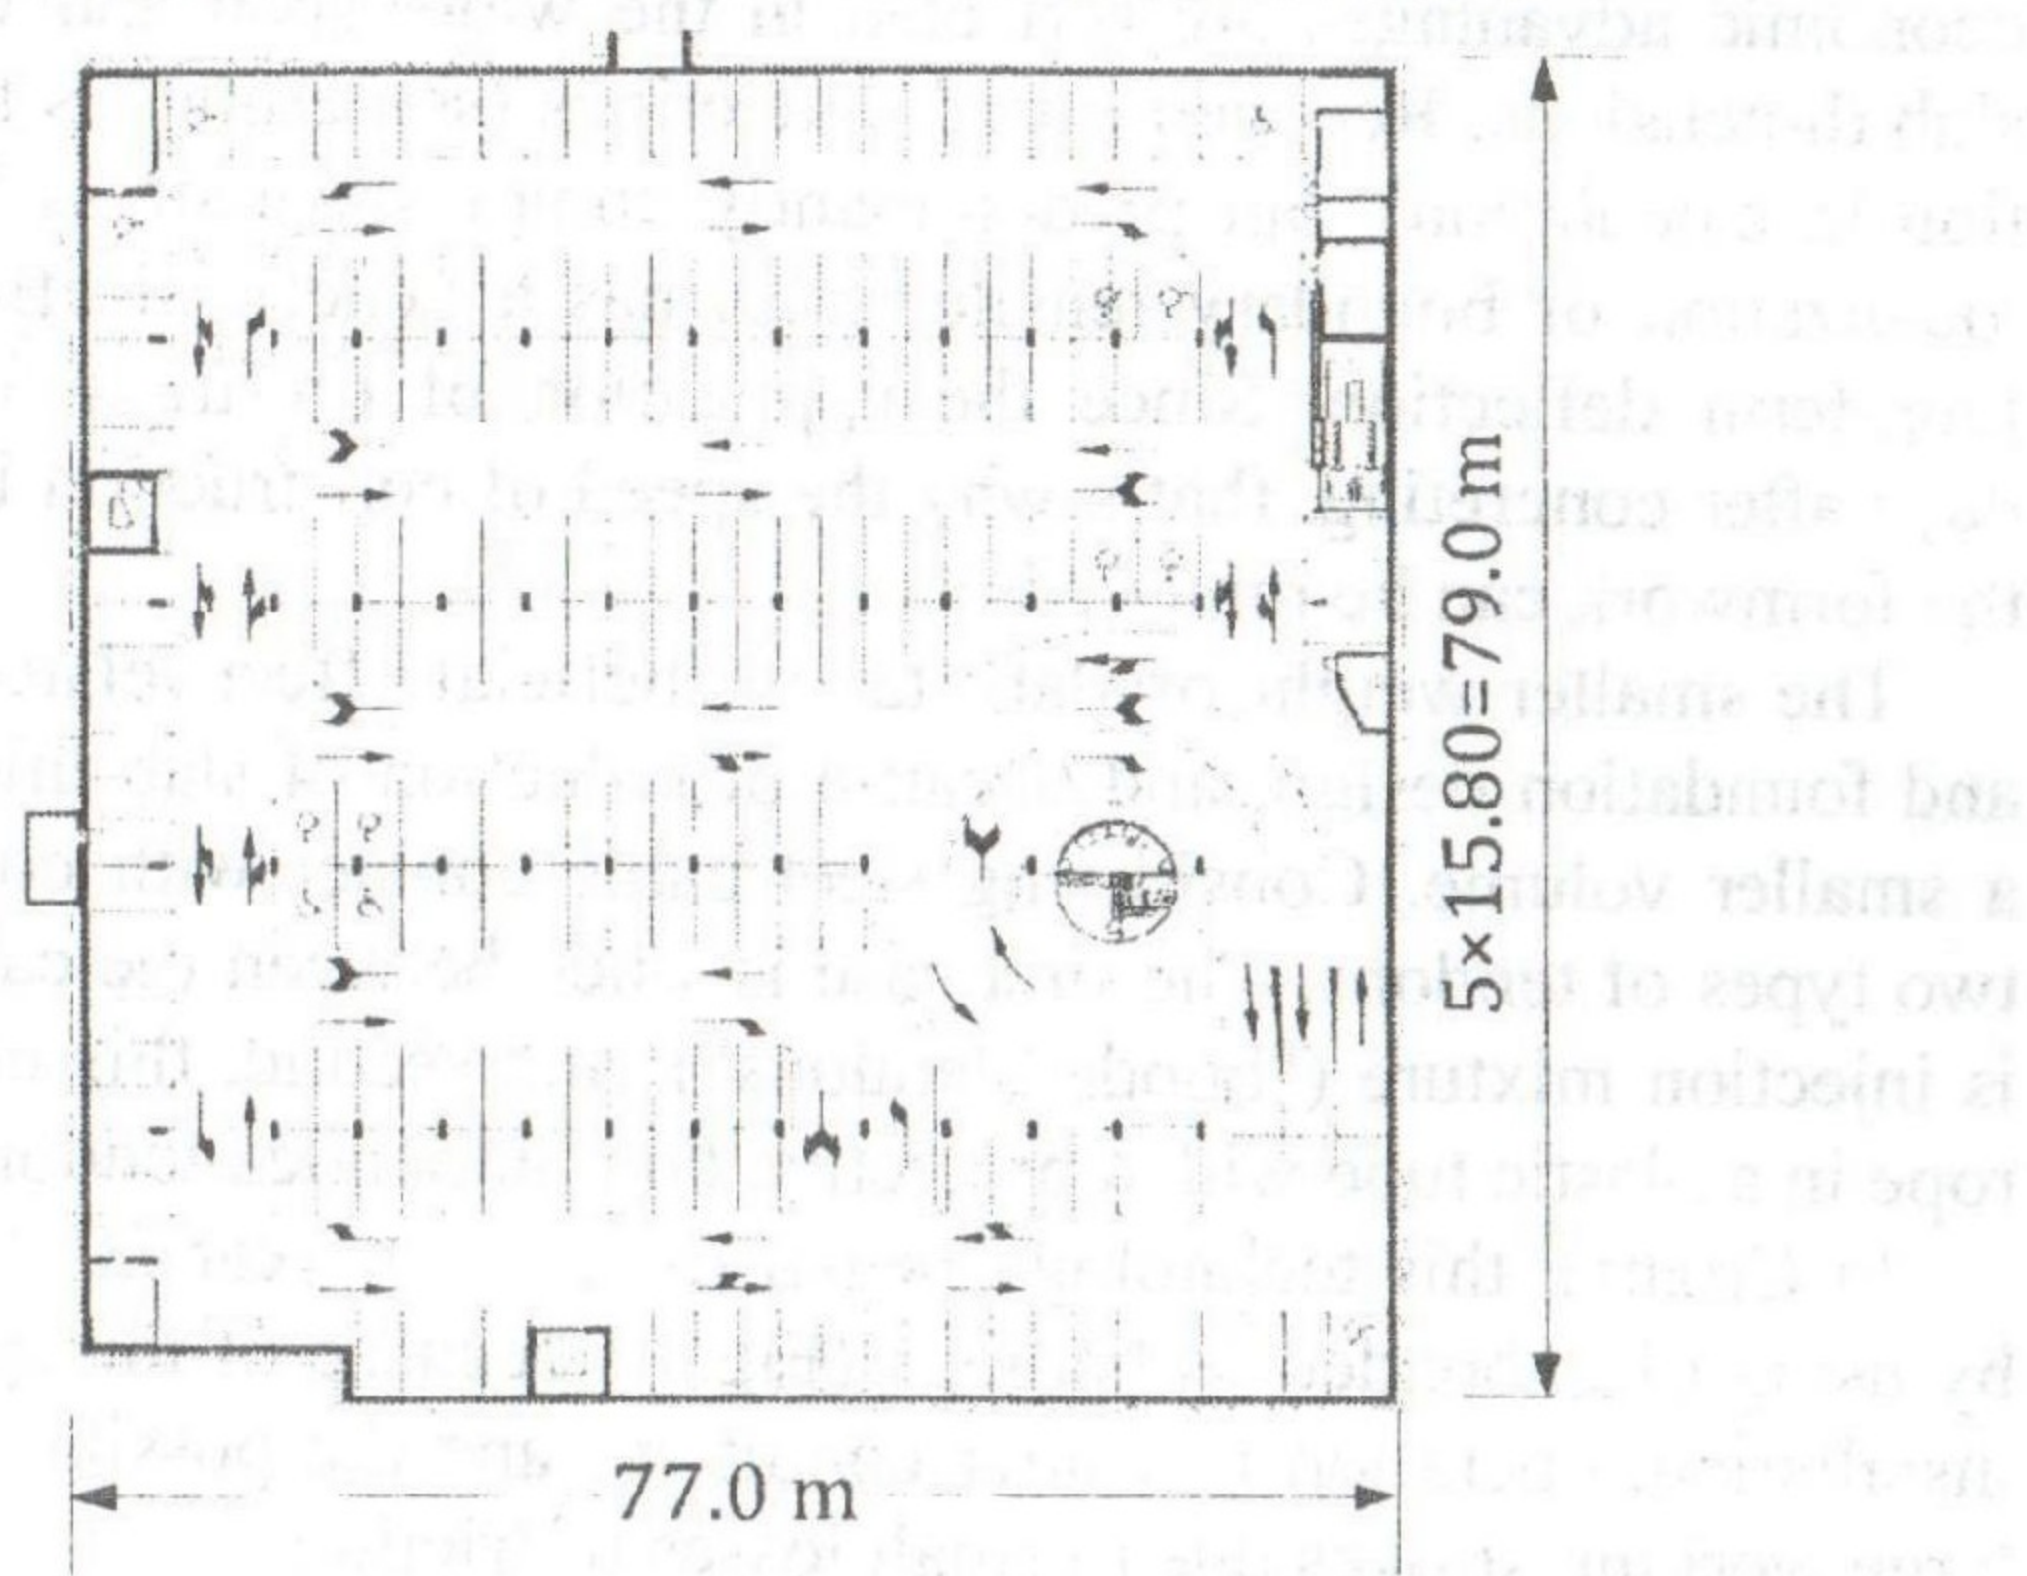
Plan of garage ground-floor, columns with spans 8.15 x 5.0 m
